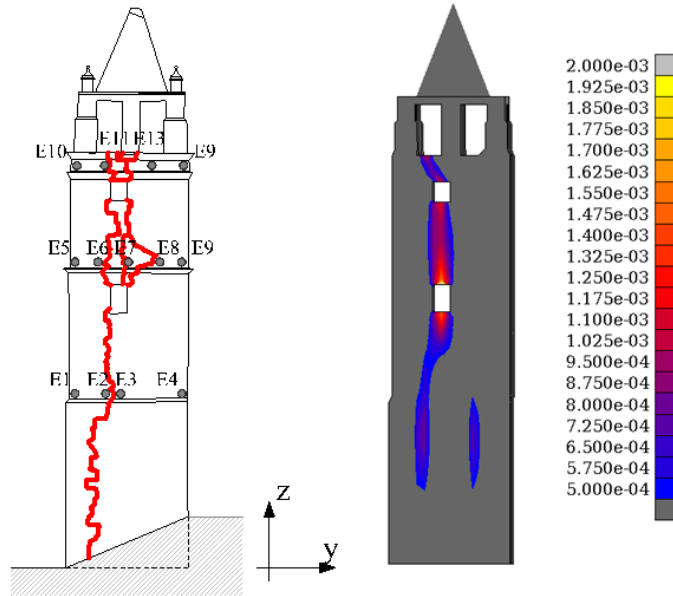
Mogadouro tower East façade, surveyed (on the left) and numerical (on the right) cracking pattern.
